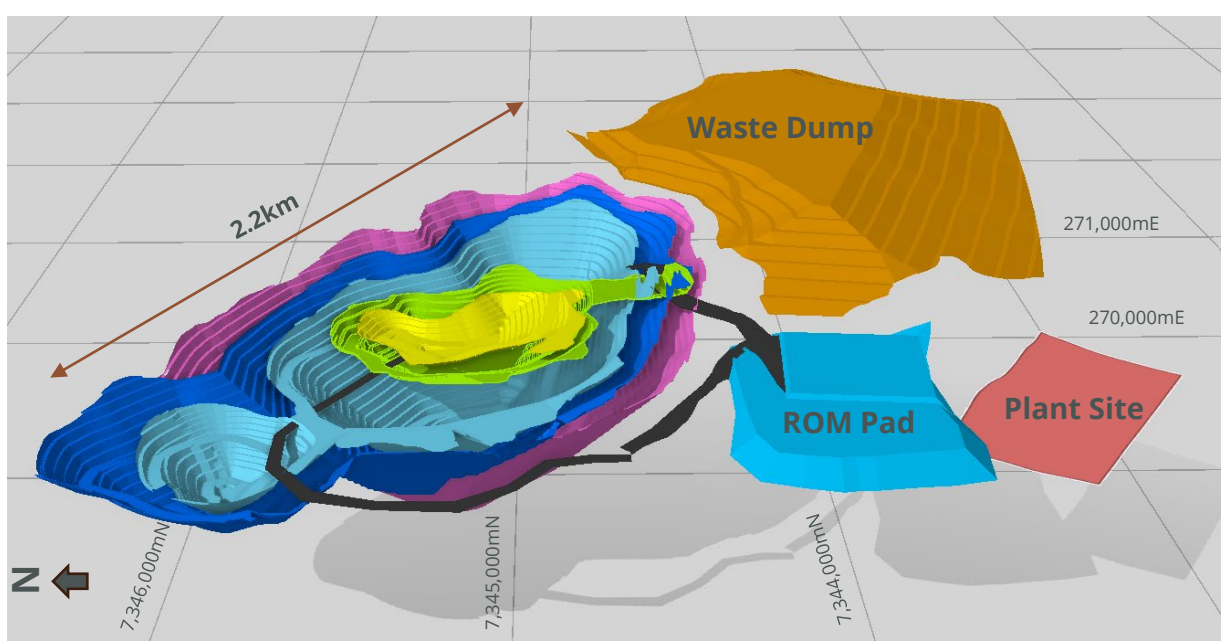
Perspective view (looking east) of optimised pit shells showing waste rock dump, haul roads, ROM pad and process plant locations.
